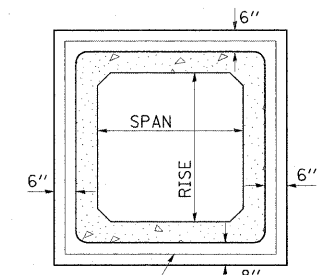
DETAILS OF CONCRETE COLLAR FOR PRECAST BOX CULVERT
